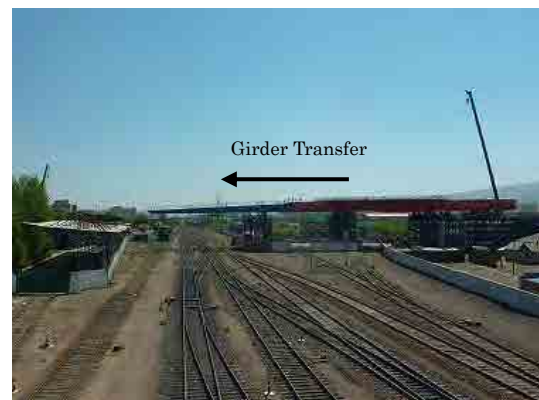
Erection Method over the Railway Track (Narny Bridge)
